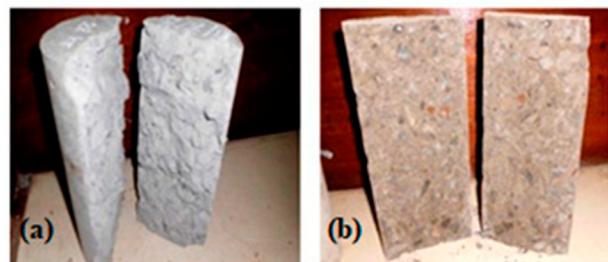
(a) Failure form of splitting tensile force at concrete cylinder made of new cement; and (b) failure form of splitting tensile force at concrete cylinder made of Portland cement.
